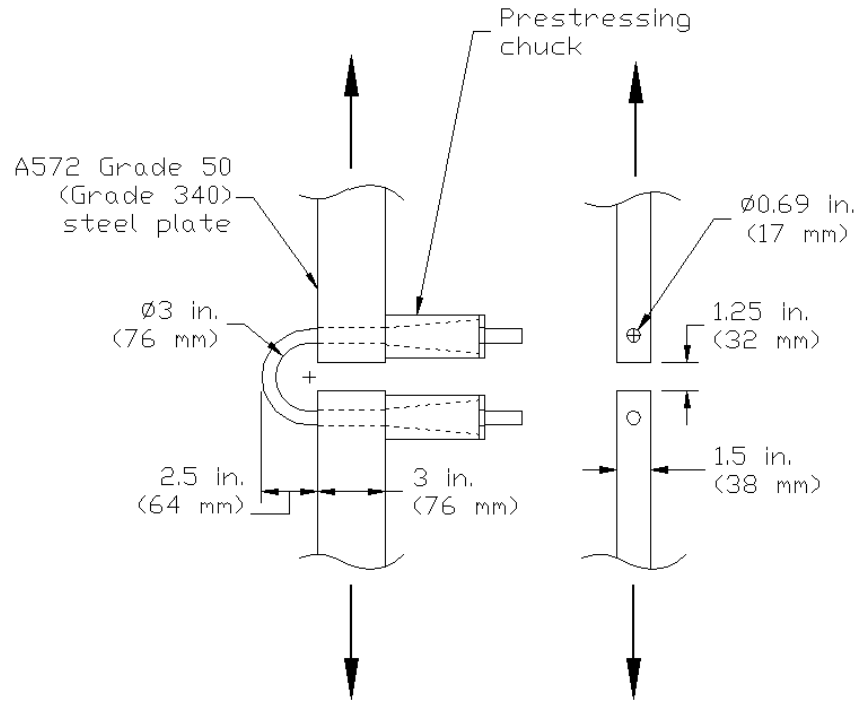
Plan and elevation of 3 in. (76 mm) diameter hook specimen test setup.
